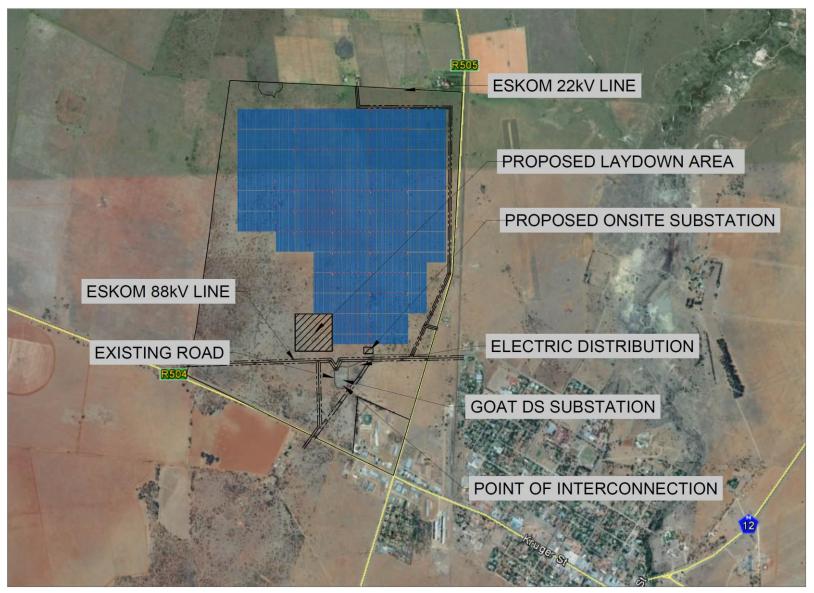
Locality map showing the layout plan for the proposed Wolmaransstad 75MW Solar Energy Facility
